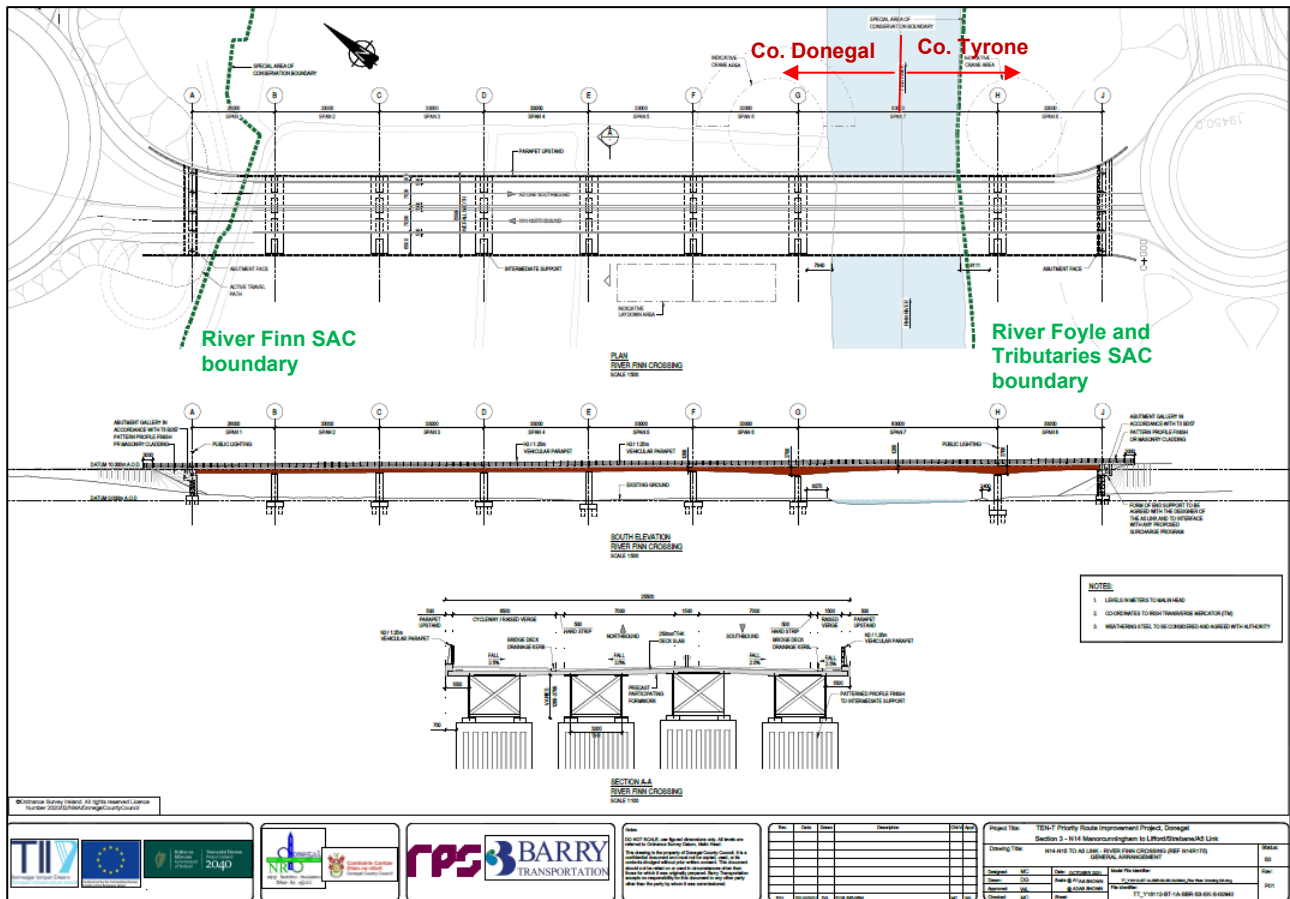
N14/N15 to A5 Link - River Finn Crossing General Arrangement
